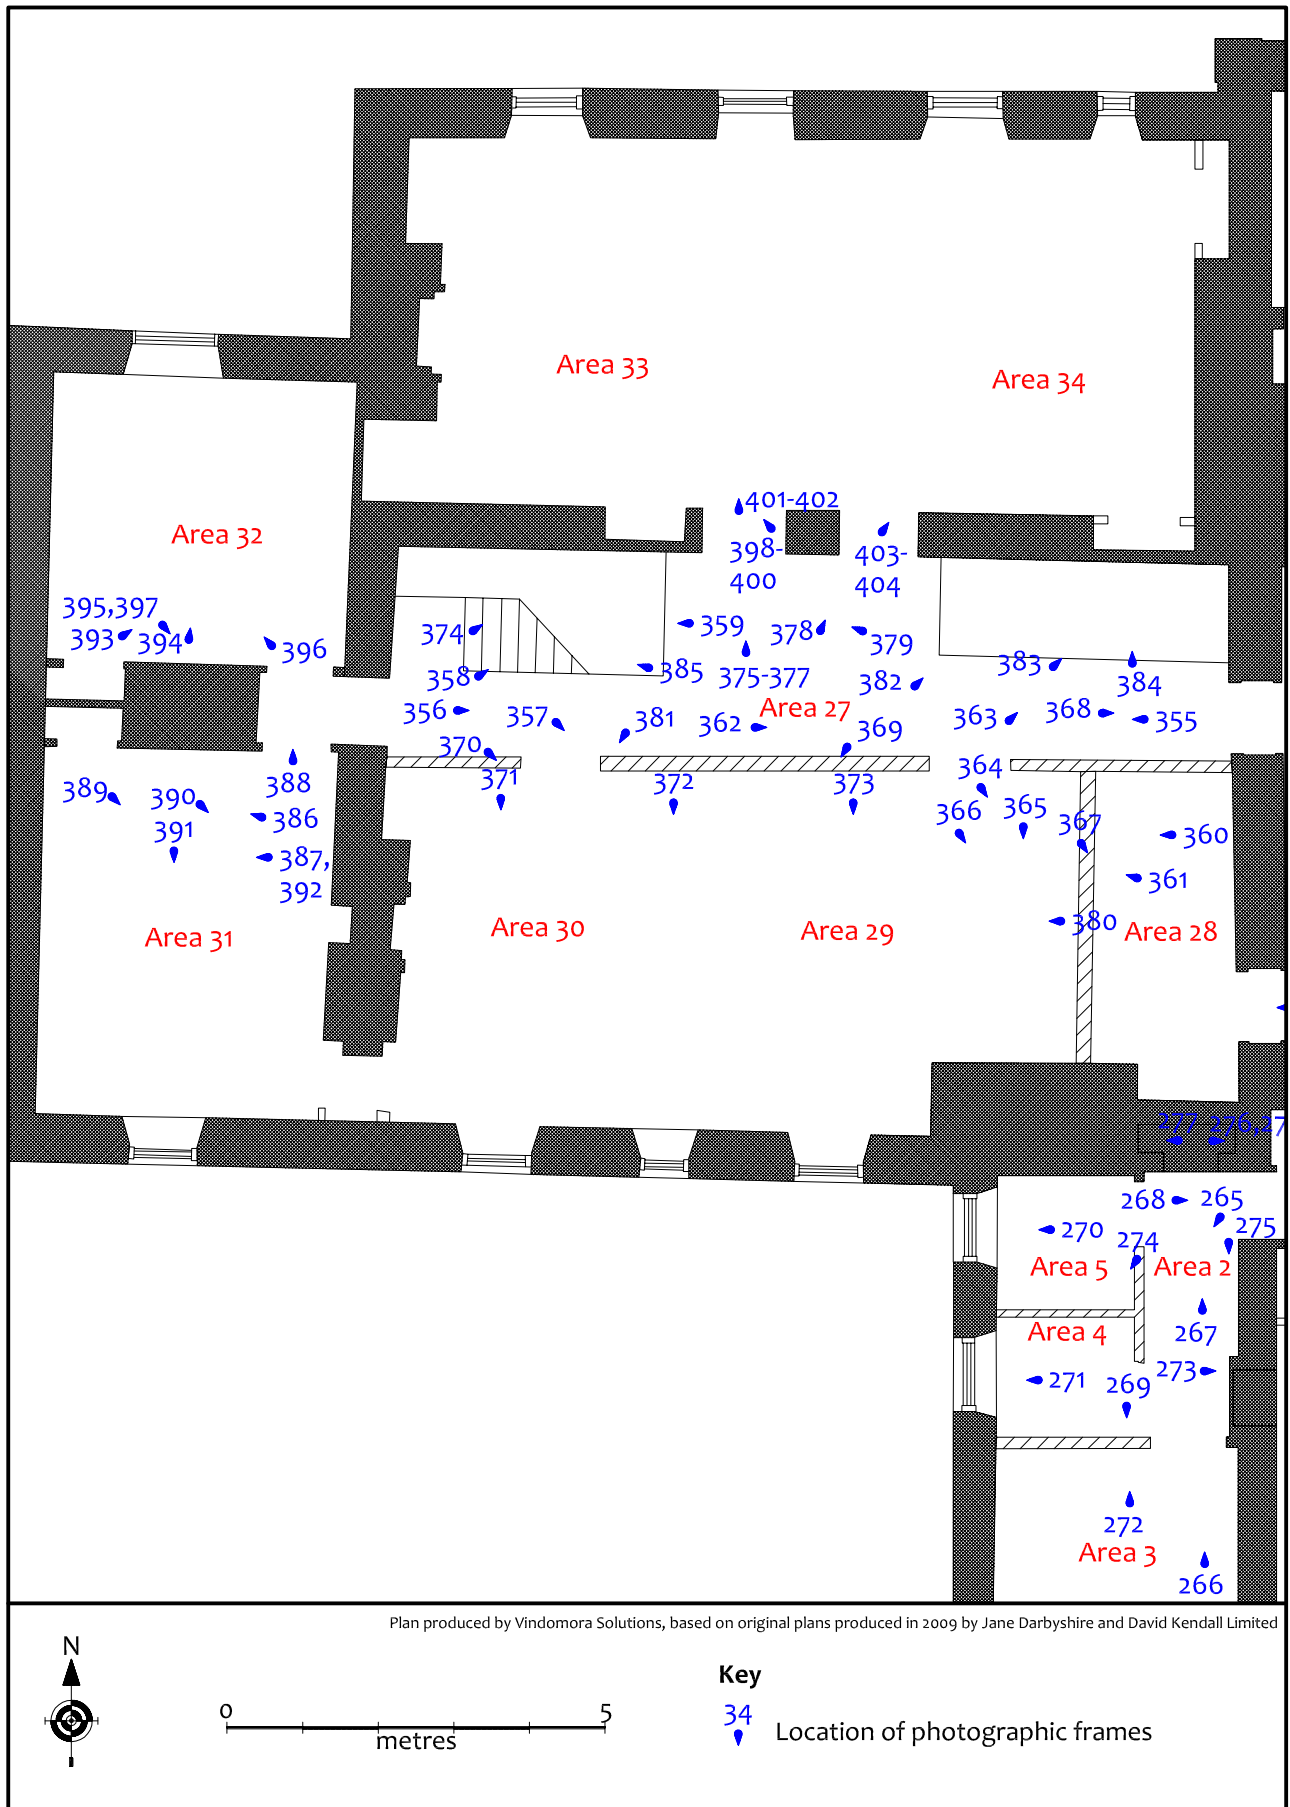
First floor plan showing location of photographic frames. Areas 2, 4-5, 27-34
